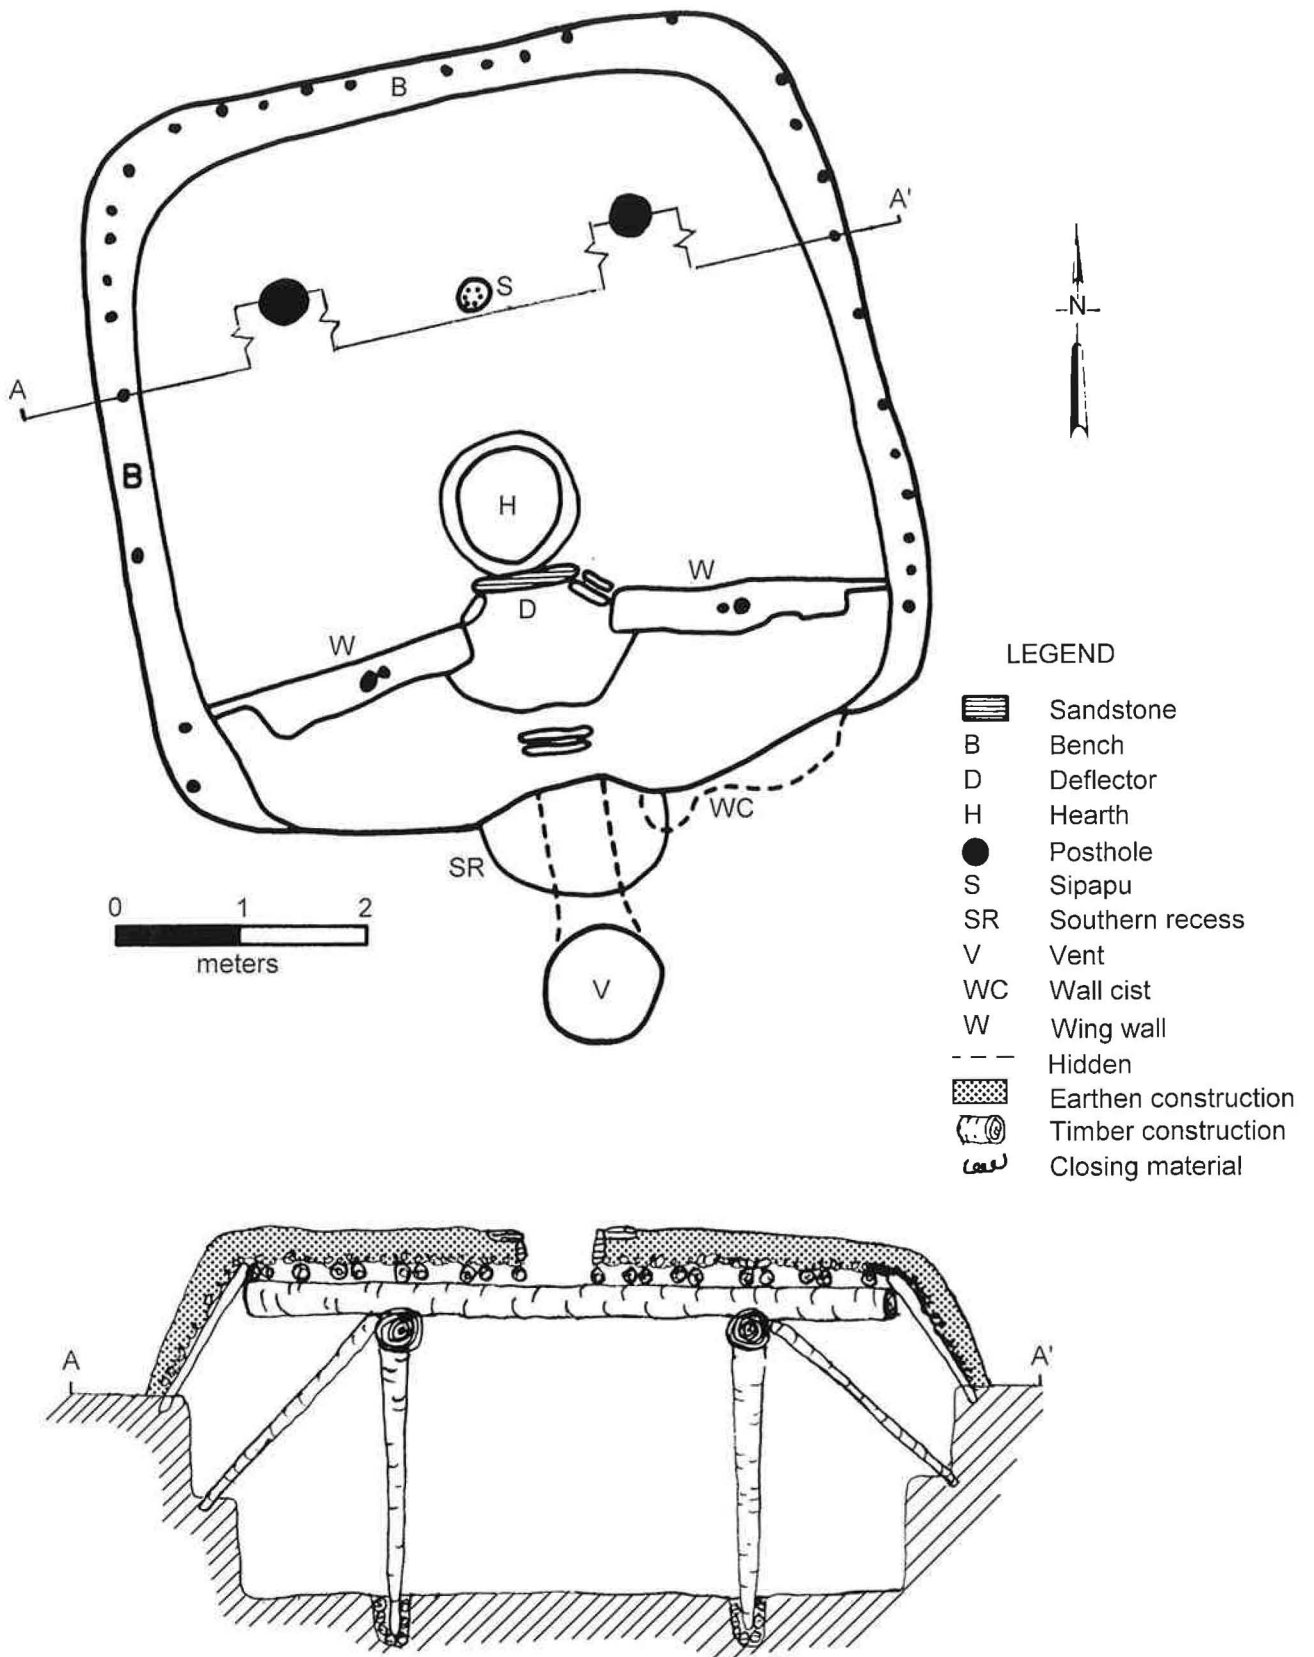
Plan view and architectural reconstruction of Pit Structure 2 at Windy Wheat hamlet (site 5MT4644). Reconstruction shown in profile (after Wilshusen 1988b:Figures 18.1 and 18.8).
